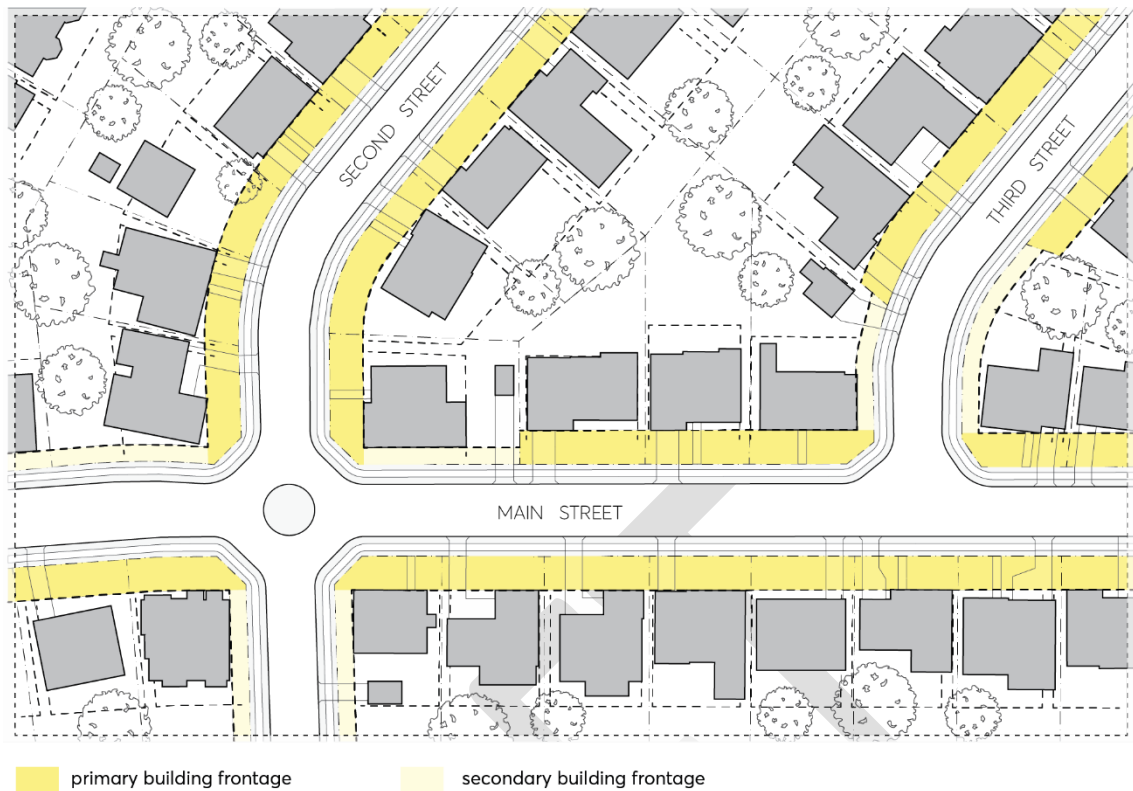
Determining primary and secondary street frontages on infill lots
